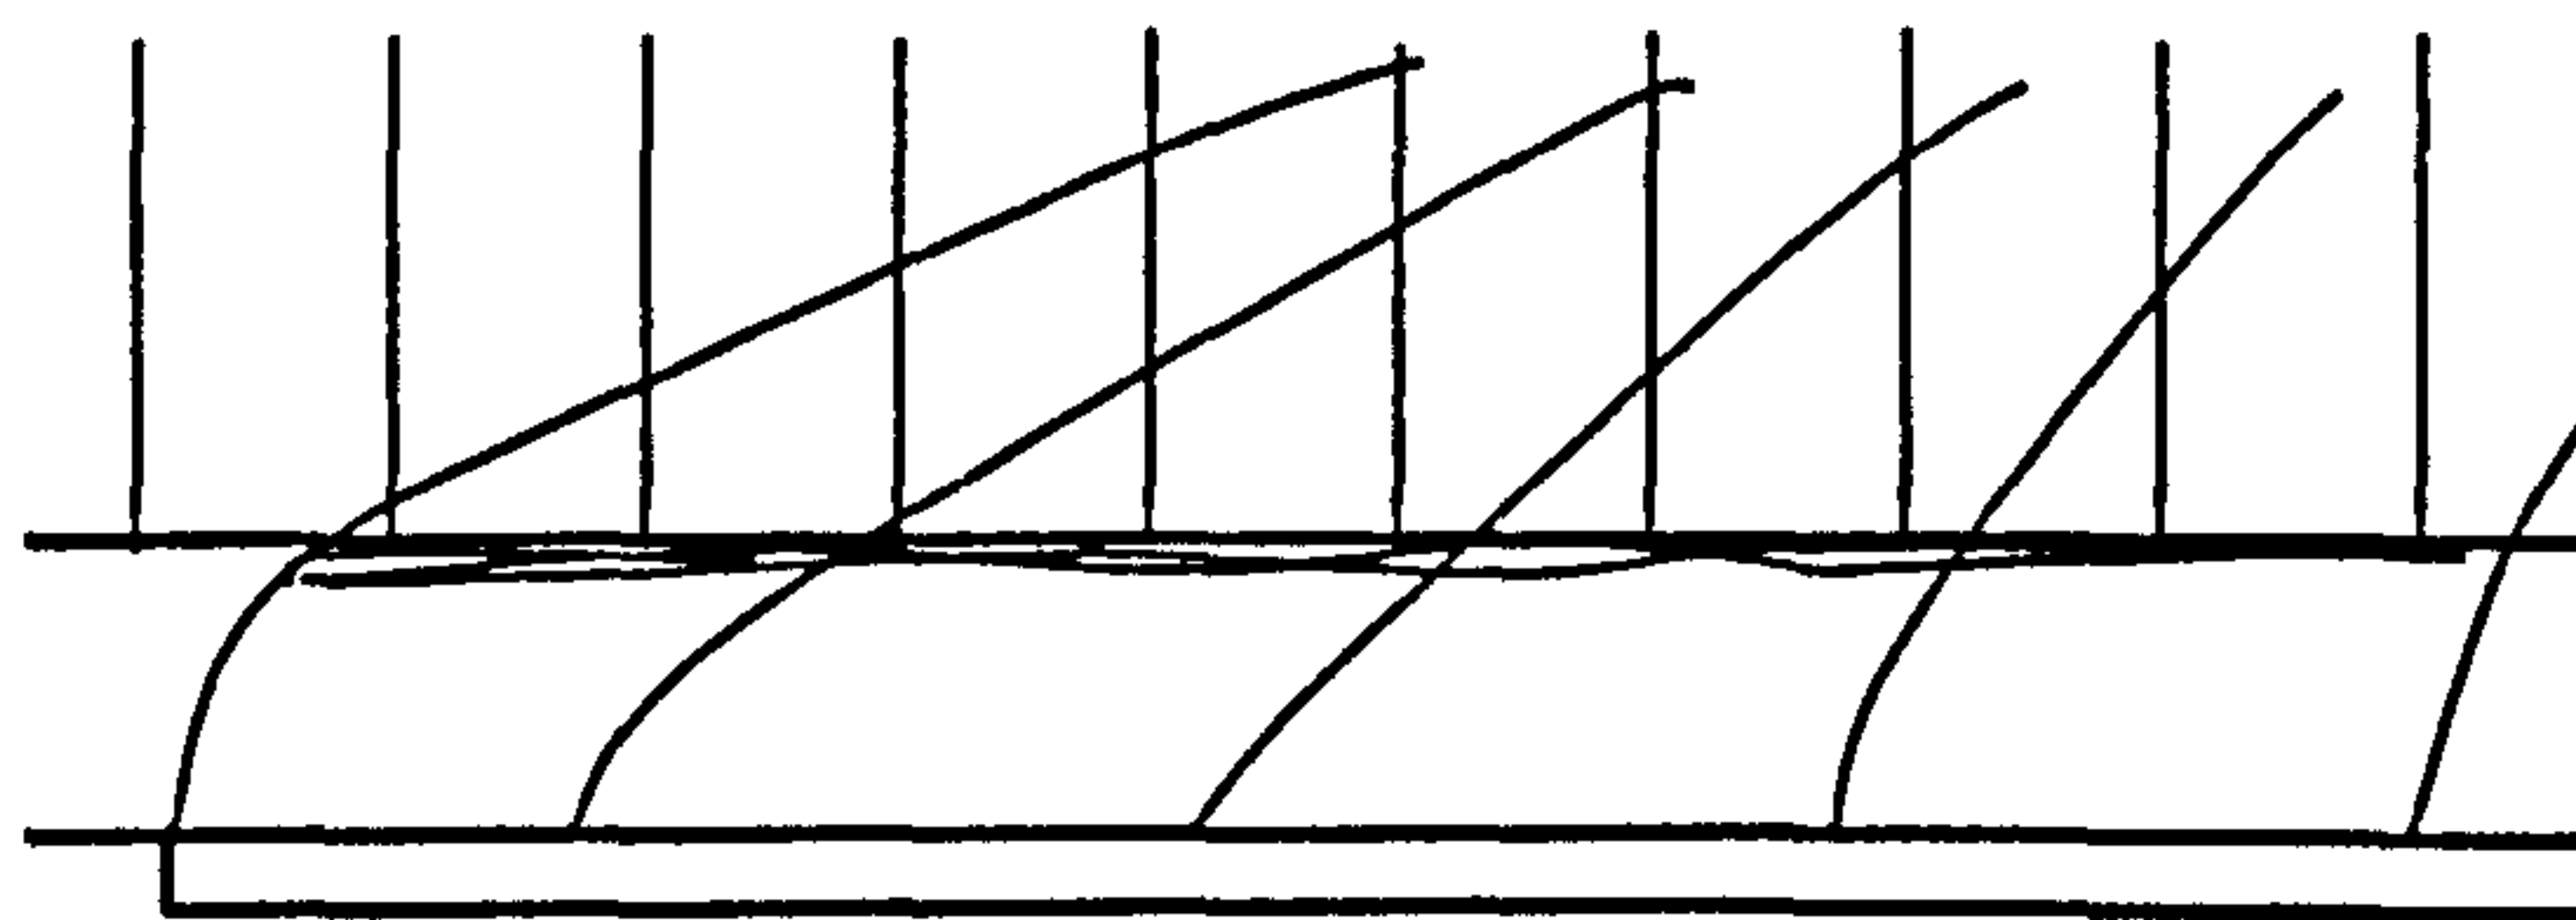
Pattern of concrete cracking associated with plate peeling failure.
